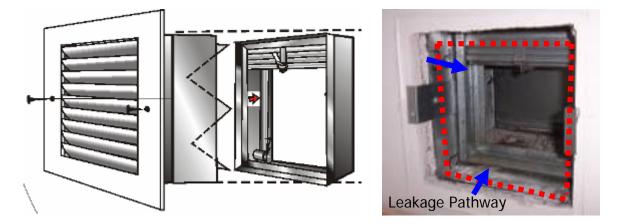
Exhaust Grille Assembly Inserted Into Rough Opening
